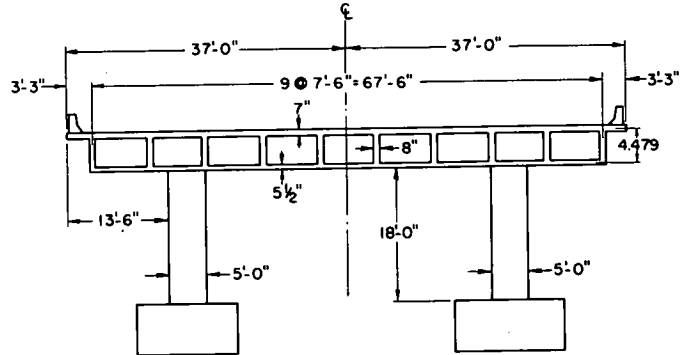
Cases 6-11, Part 2, Double-Column Bridge Cross Section
